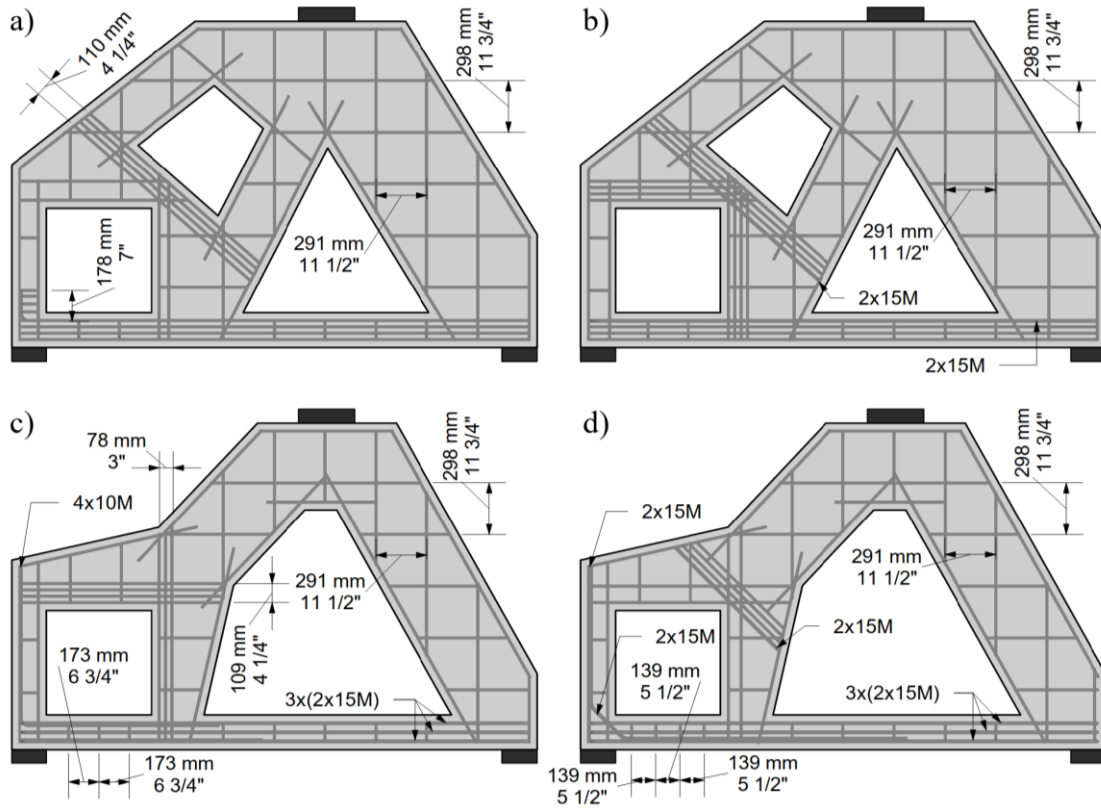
Reinforcement layout designed using the GTM: a) SIV.a; b) SIV.b; c) SIV.c; and d) SIV.d.
